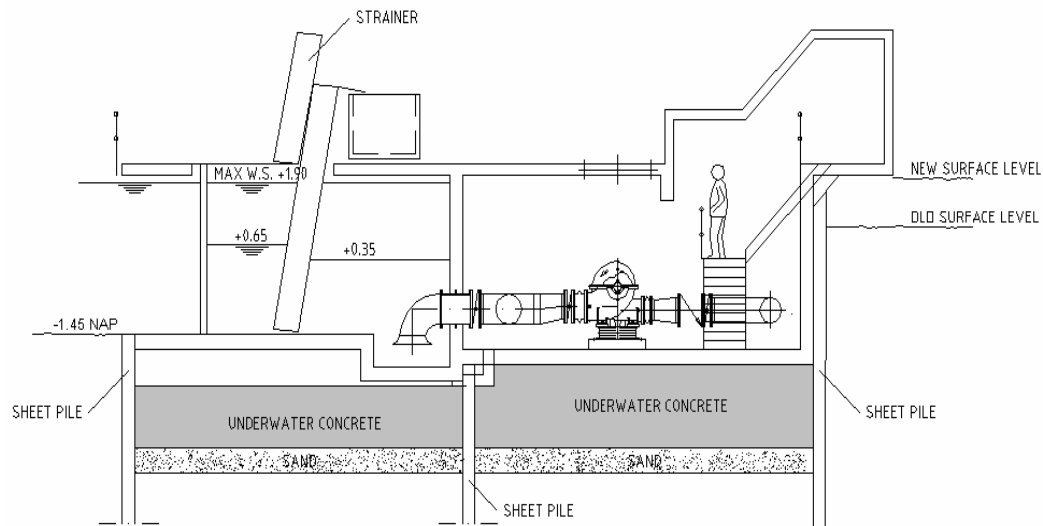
Cross Section of Intake and Raw Water Pump Station
